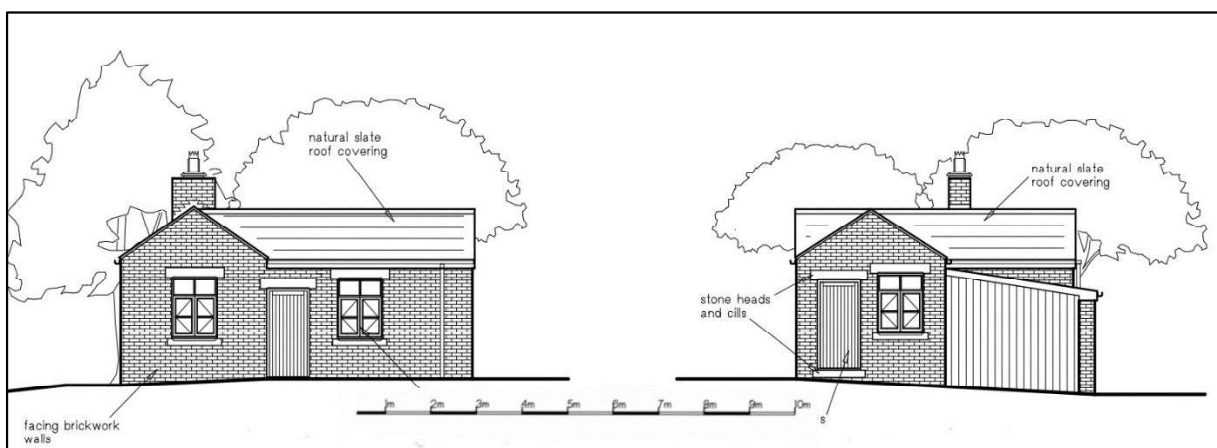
East and north elevations of the cottage (Building 2) (produced by Warwick Consultancy Ltd).
